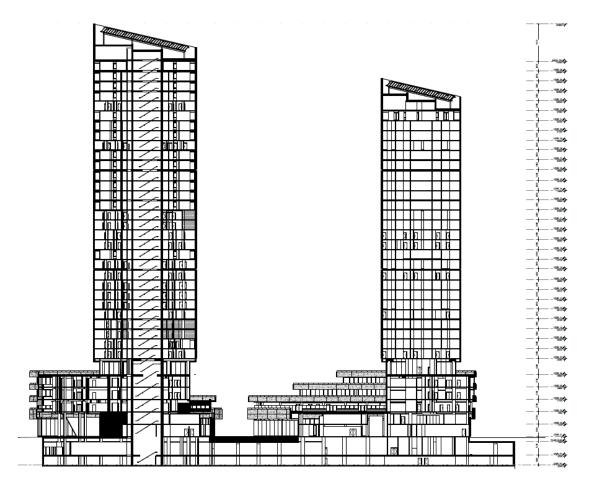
Overall section drawing, south elevation, Dream LeBreton. Source: Perkins&Will KPMB, 14 April 2022.
